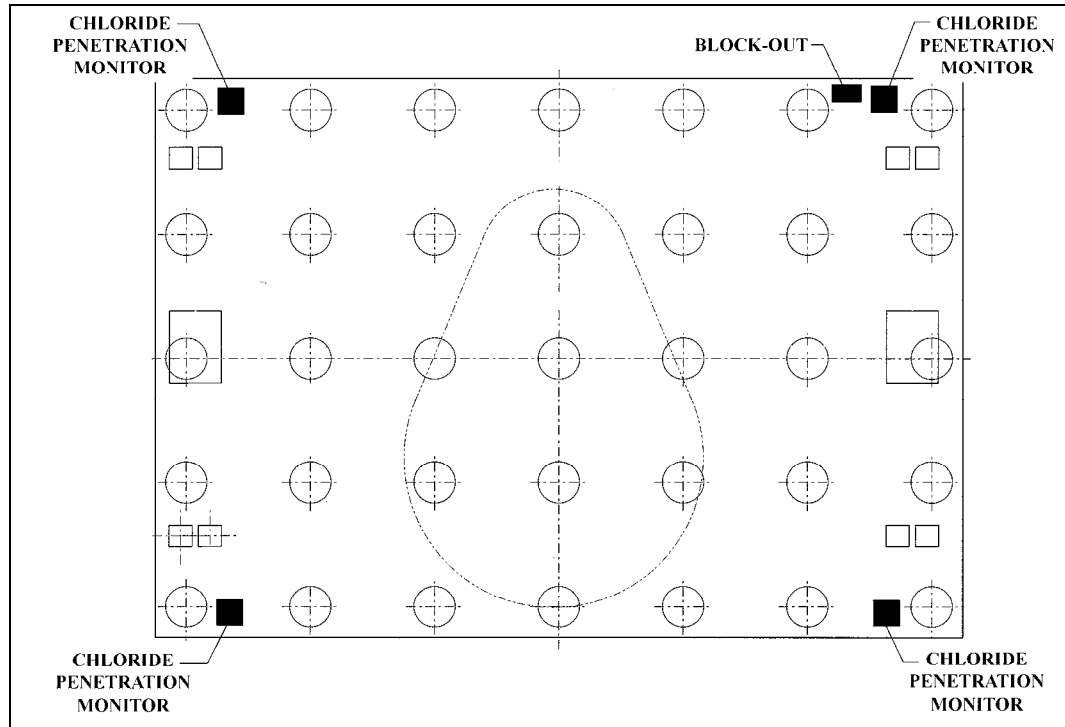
Chloride Penetration Monitor Locations (Plan View) (Modified IRIB Specifications and Construction Plans)
